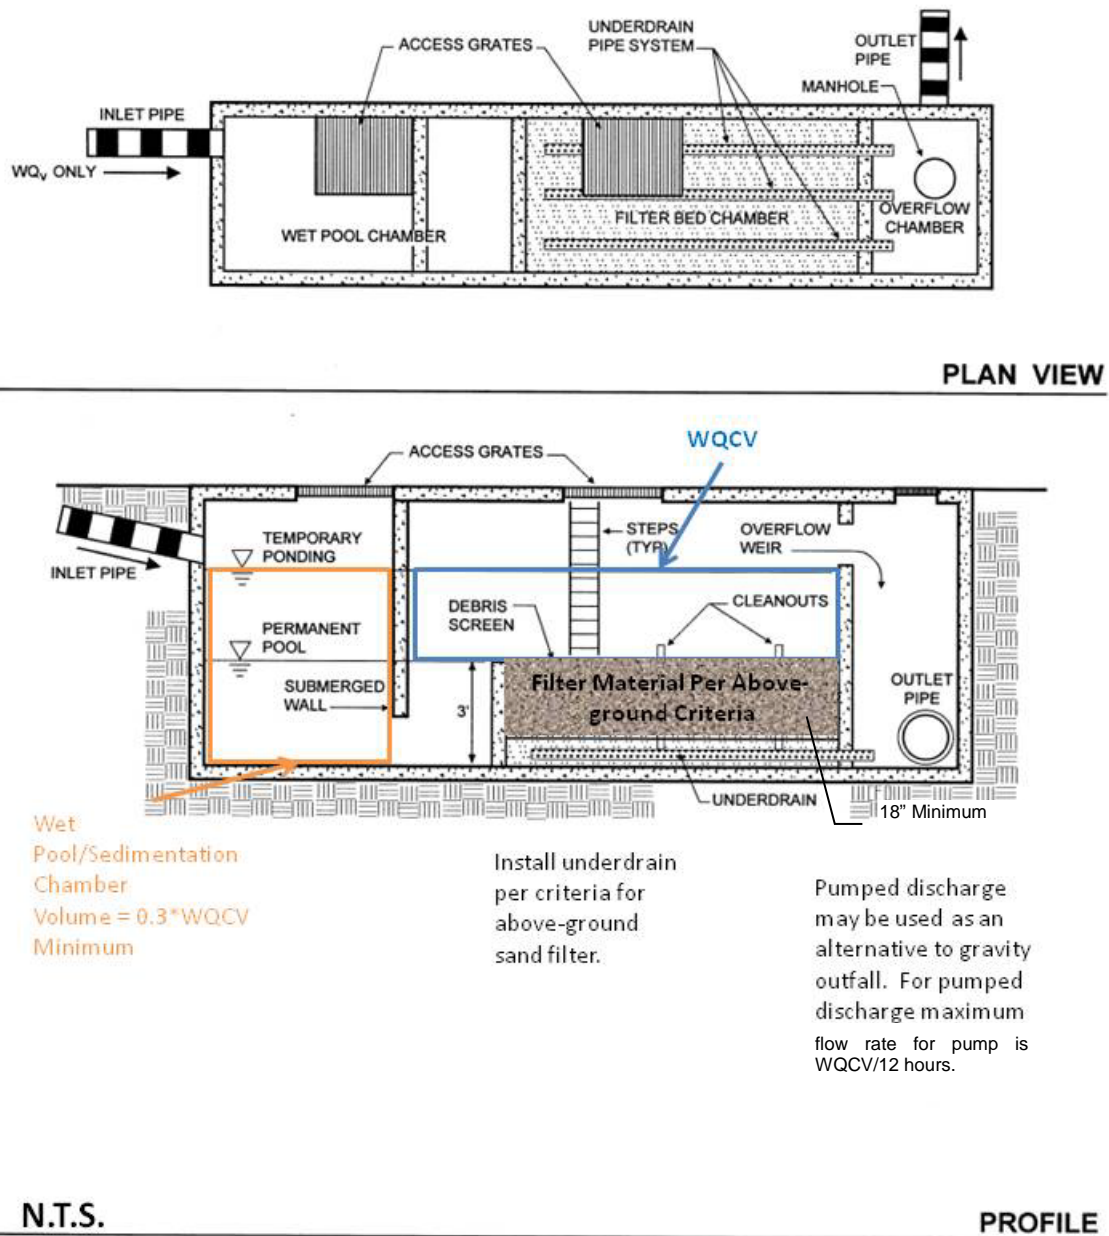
Typical plan and Profile for Underground Sand Filter (Source: Center for Watershed Protection with modifications)
